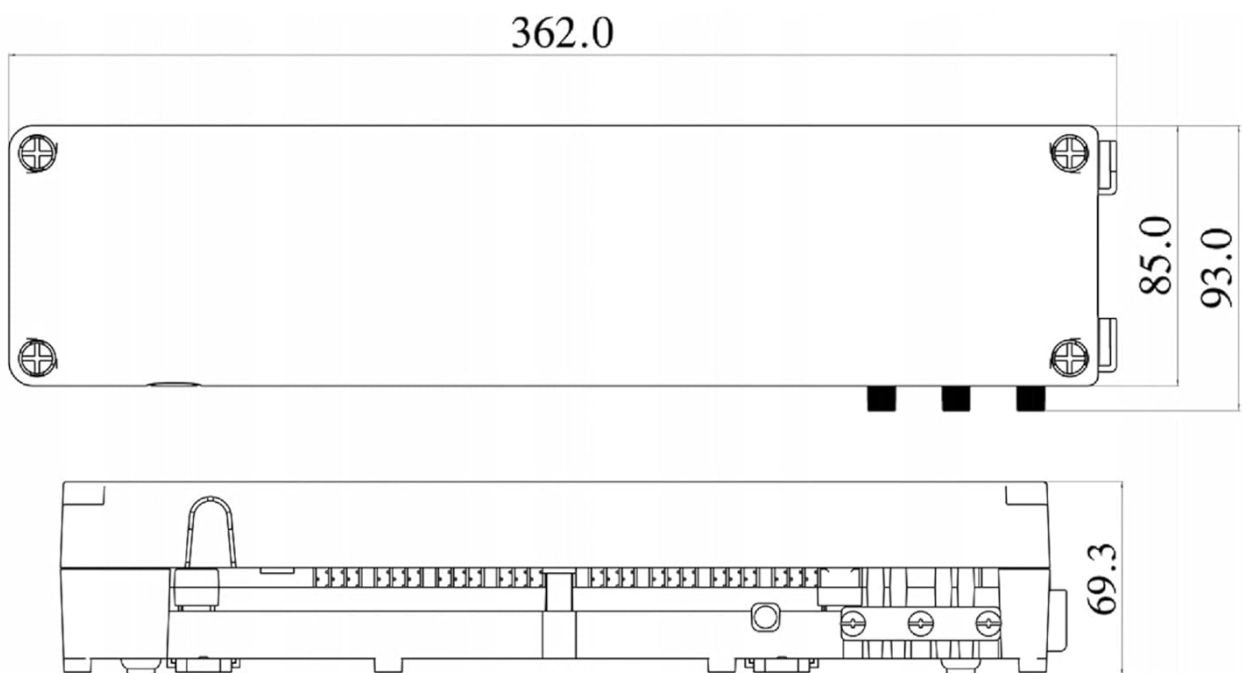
Dimensional Drawing of Salus Controls KL08RF Wiring Centre. A technical drawing illustrating the precise measurements (length: 362.0 mm, width: 85.0-93.0 mm, height: 69.3 mm) of the KL08RF unit, crucial for planning installation space.
